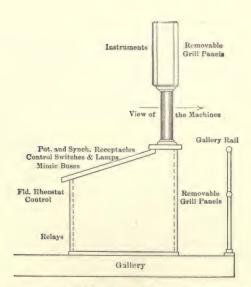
A Gallery Type of Bench-board which Permits the Operator Viewing the Machines through the Board.
